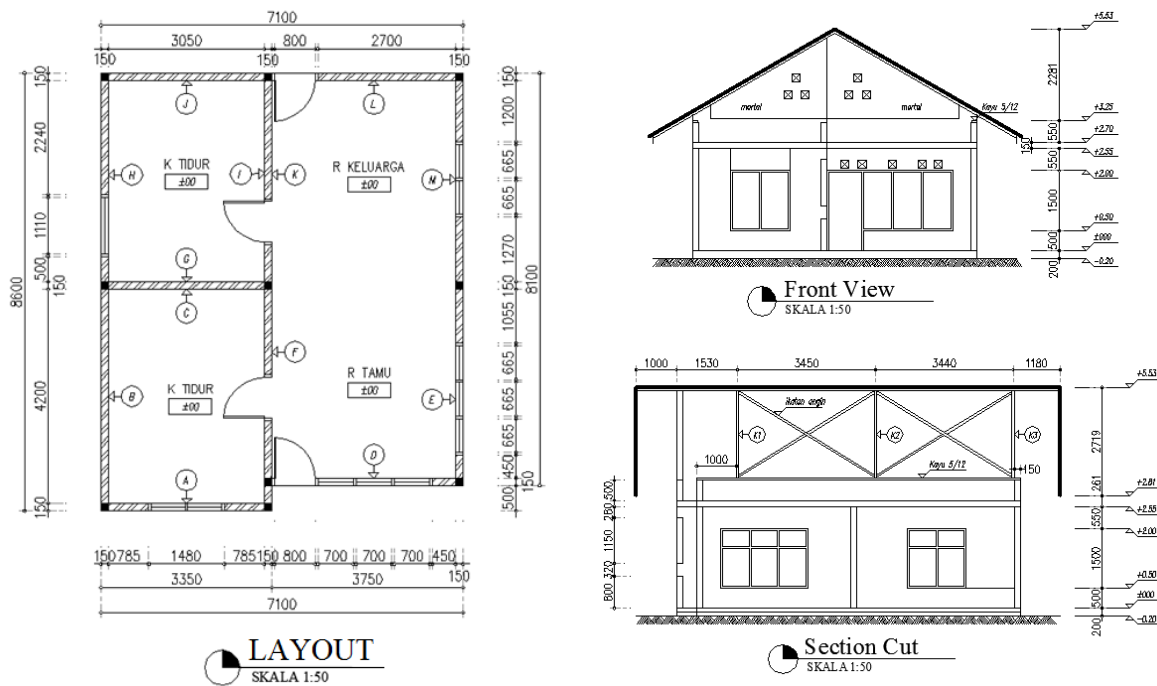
Layout of Retrofitted House in Tanjung Basung
